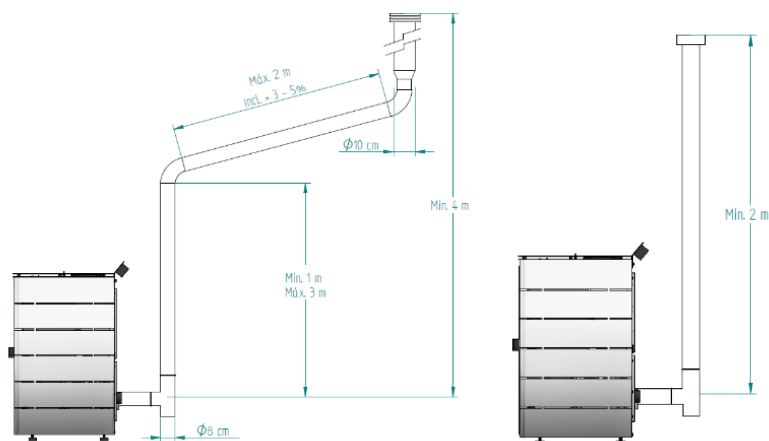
Side view of the installation without chimney, with example of the inspection point
